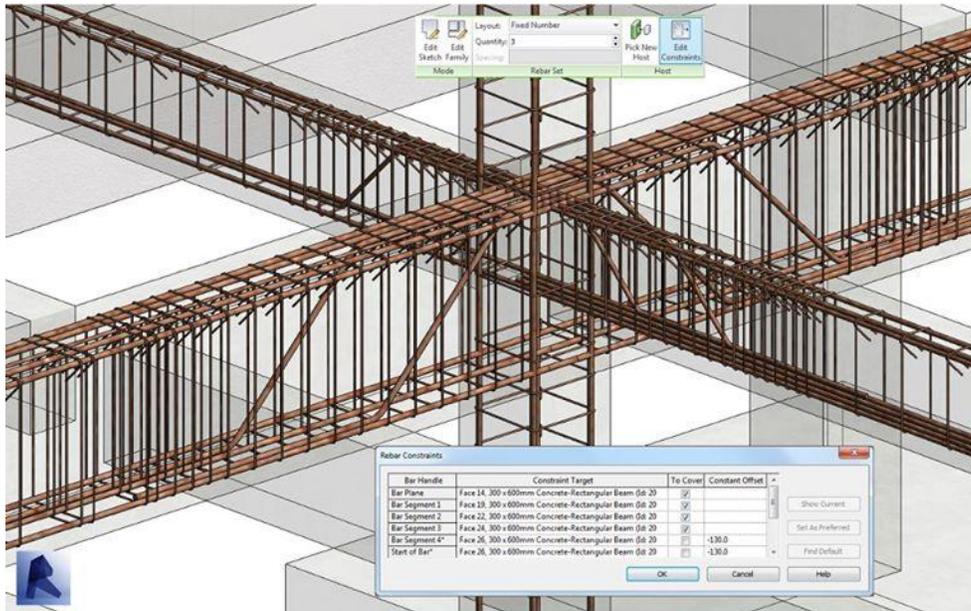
Structural Beam 3D Rebar (Image courtesy of CCIT)
